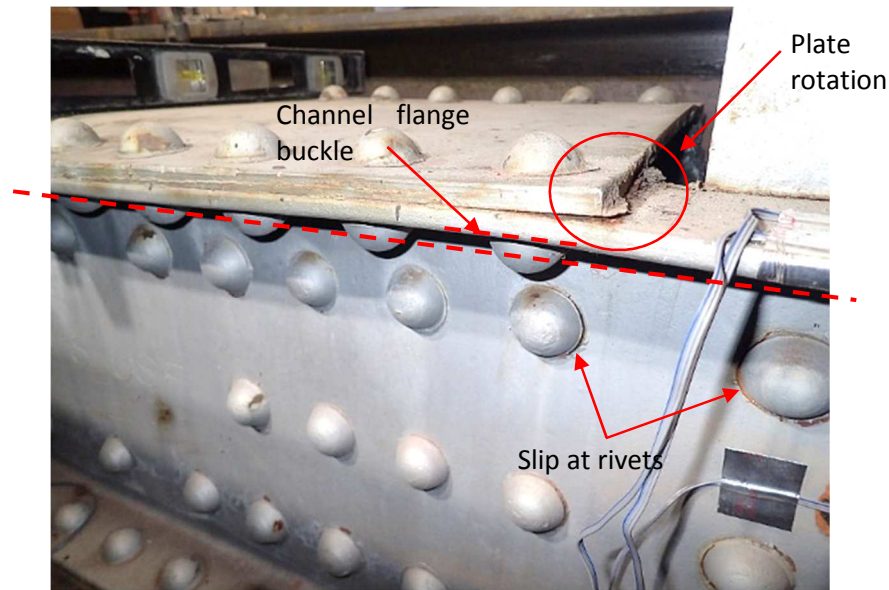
Specimen 6 after testing was completed showing buckled channel flange, slip at the rivets, and rotated end stay plate
